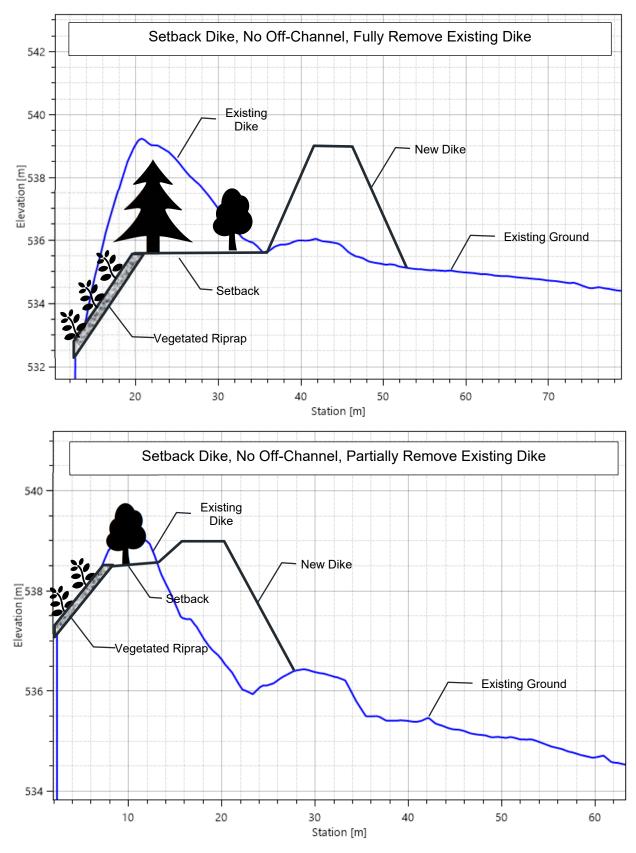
Typical Cross-Section of a Setback Dike – No Off-Channel
